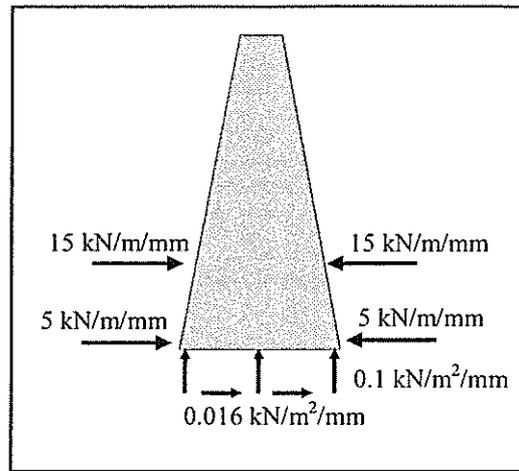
Spring Models of the Subgrade of a Single-slope Concrete Guard Fence
